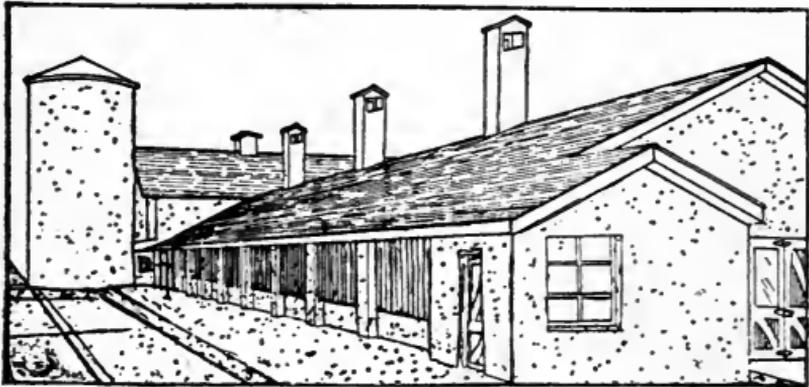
Concrete Dairy Stable and Concrete Barnyard
